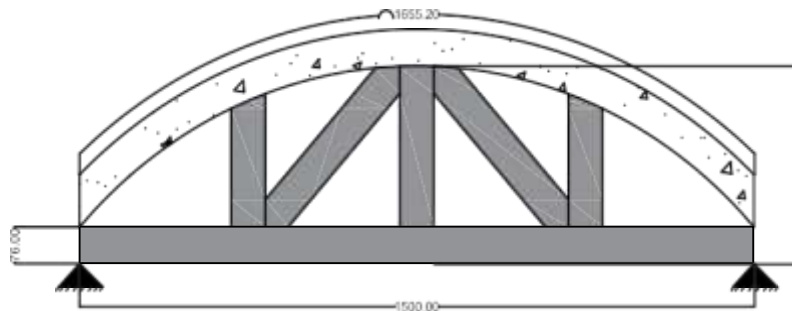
Typical shape of a composite steel-concrete arch specimen.
